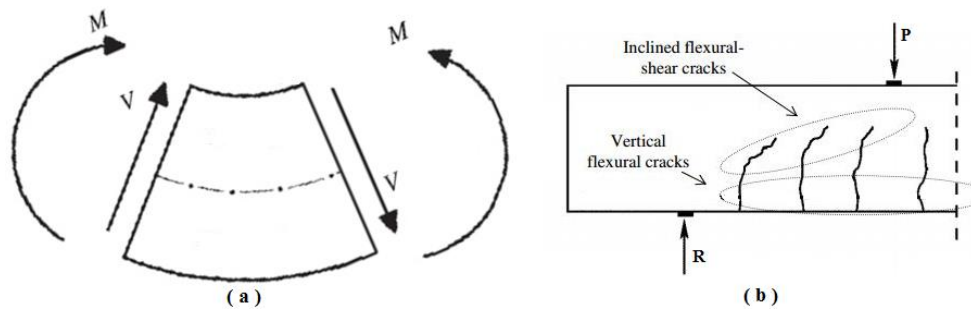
(a) Stress components in SC beam and (b) Concrete cracks during loading
